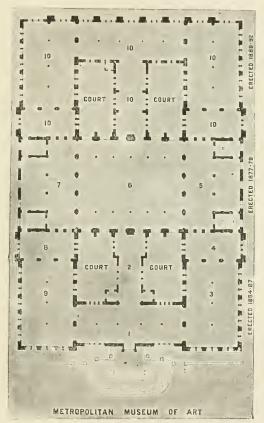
Metropolitan Museum of Art. Plan of first floor.
